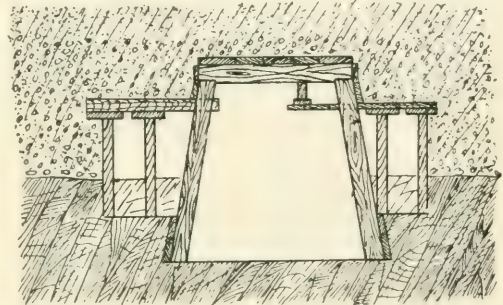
OPENING-OUT PANELLING STRIP IN LOOSE GROUND.
